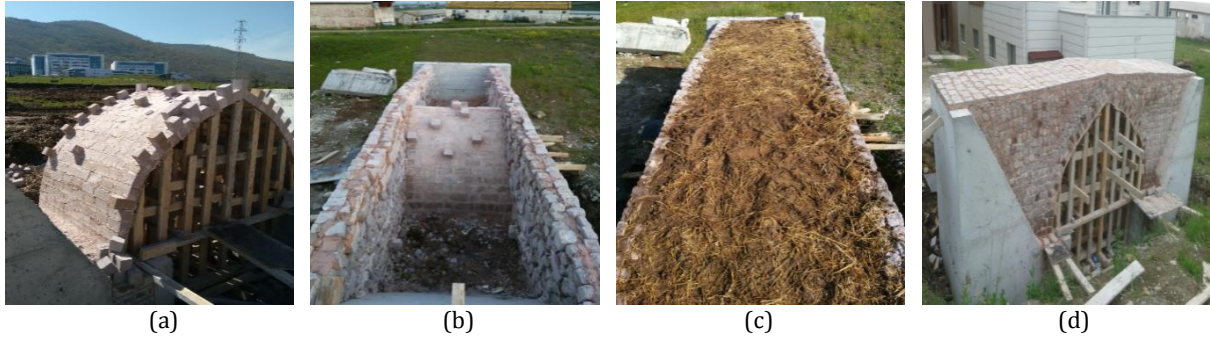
Construction steps of masonry bridge model: (a) Arch; (b) Side walls; (c) Filling; (d) Slab.
